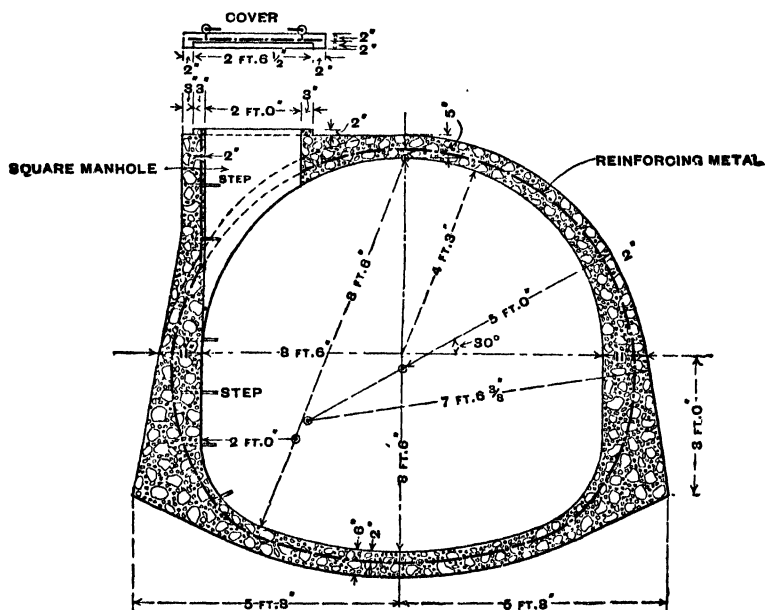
Typical Section of Jersey City Water Supply Conduit in Loose Earth.
